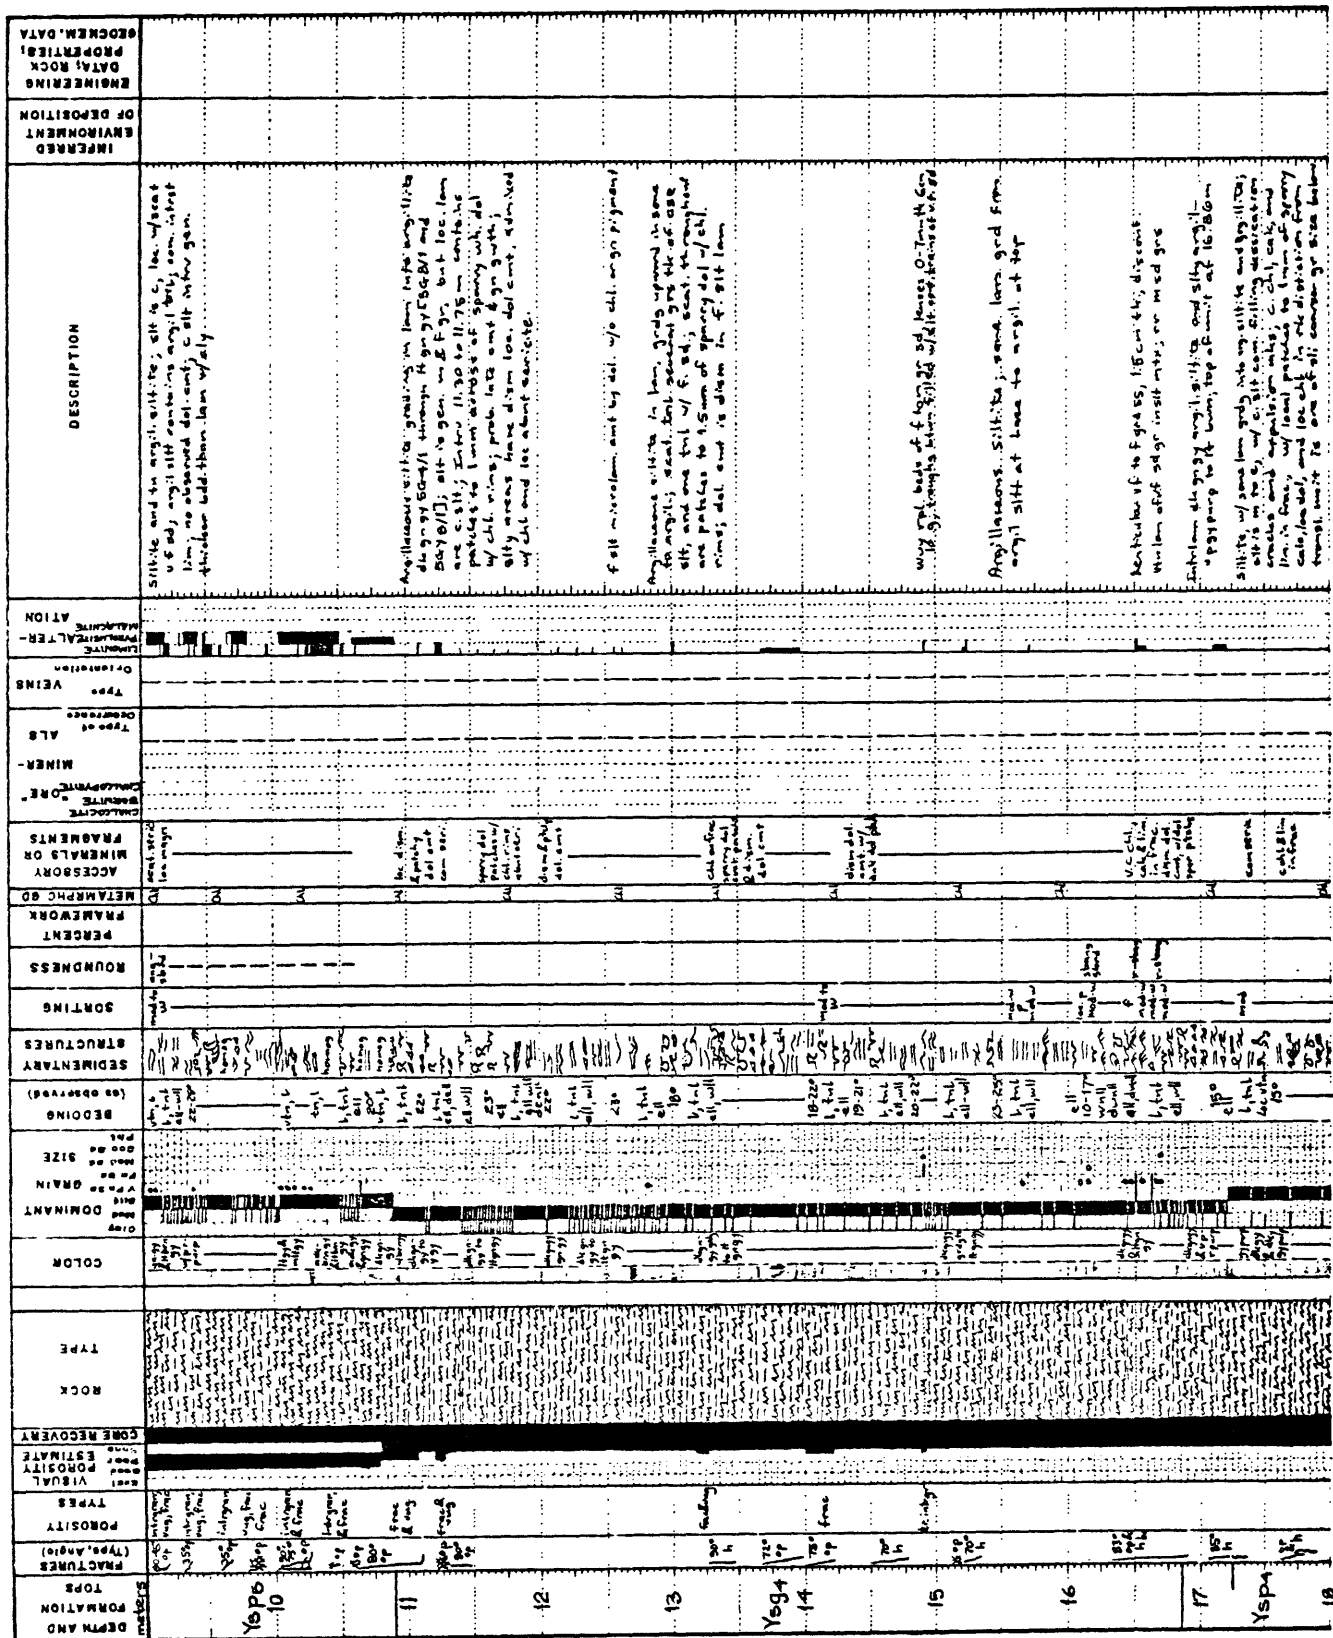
Description of drill core from Blacktail Mountain, Montana, core hole BT-2 - Continued
